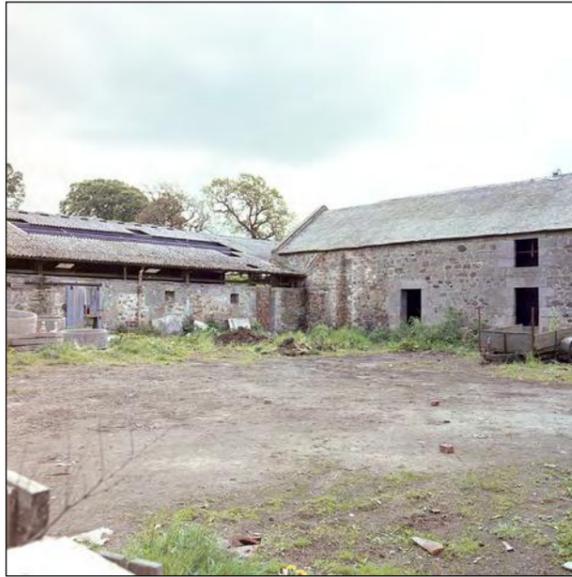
Range A, North elevation (part of) and Wall F supporting the modern cattle court.
